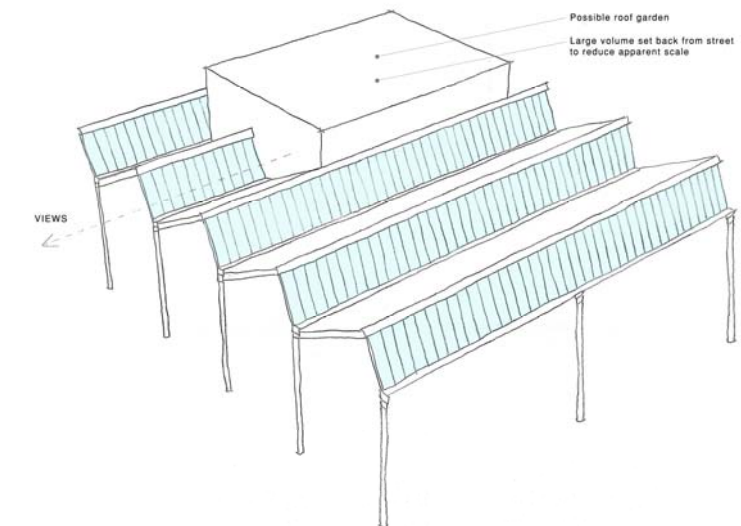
New build volumes built over and out of the weaving shed roof to offer views over
